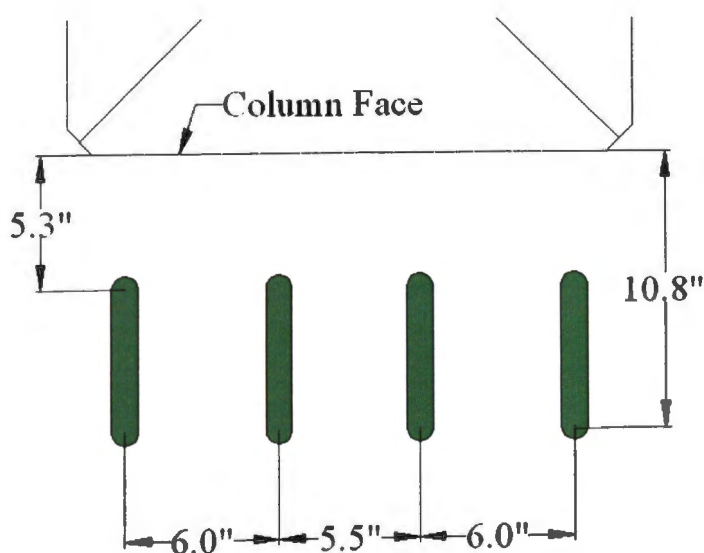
Embedment Locations of Anchor Rods in Footing
